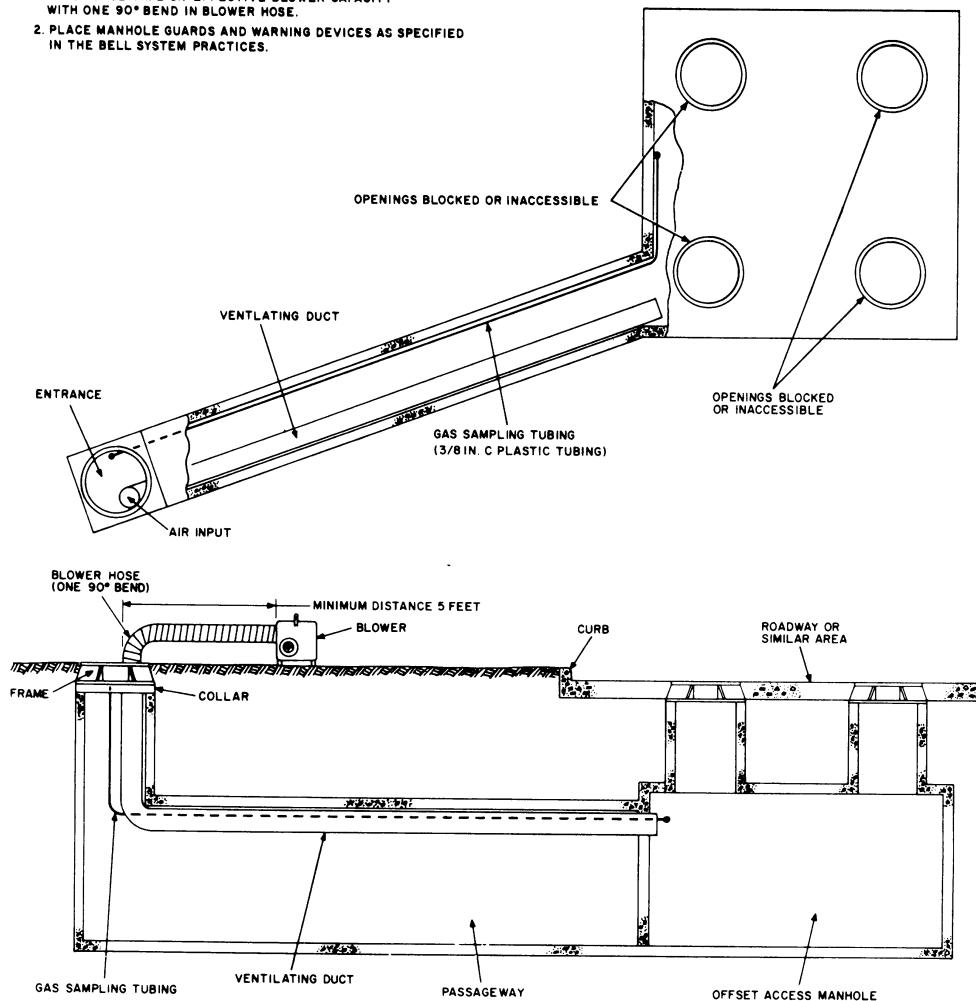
Typical Setup for Purging Offset Access Manhole With No Entrance Manhole
